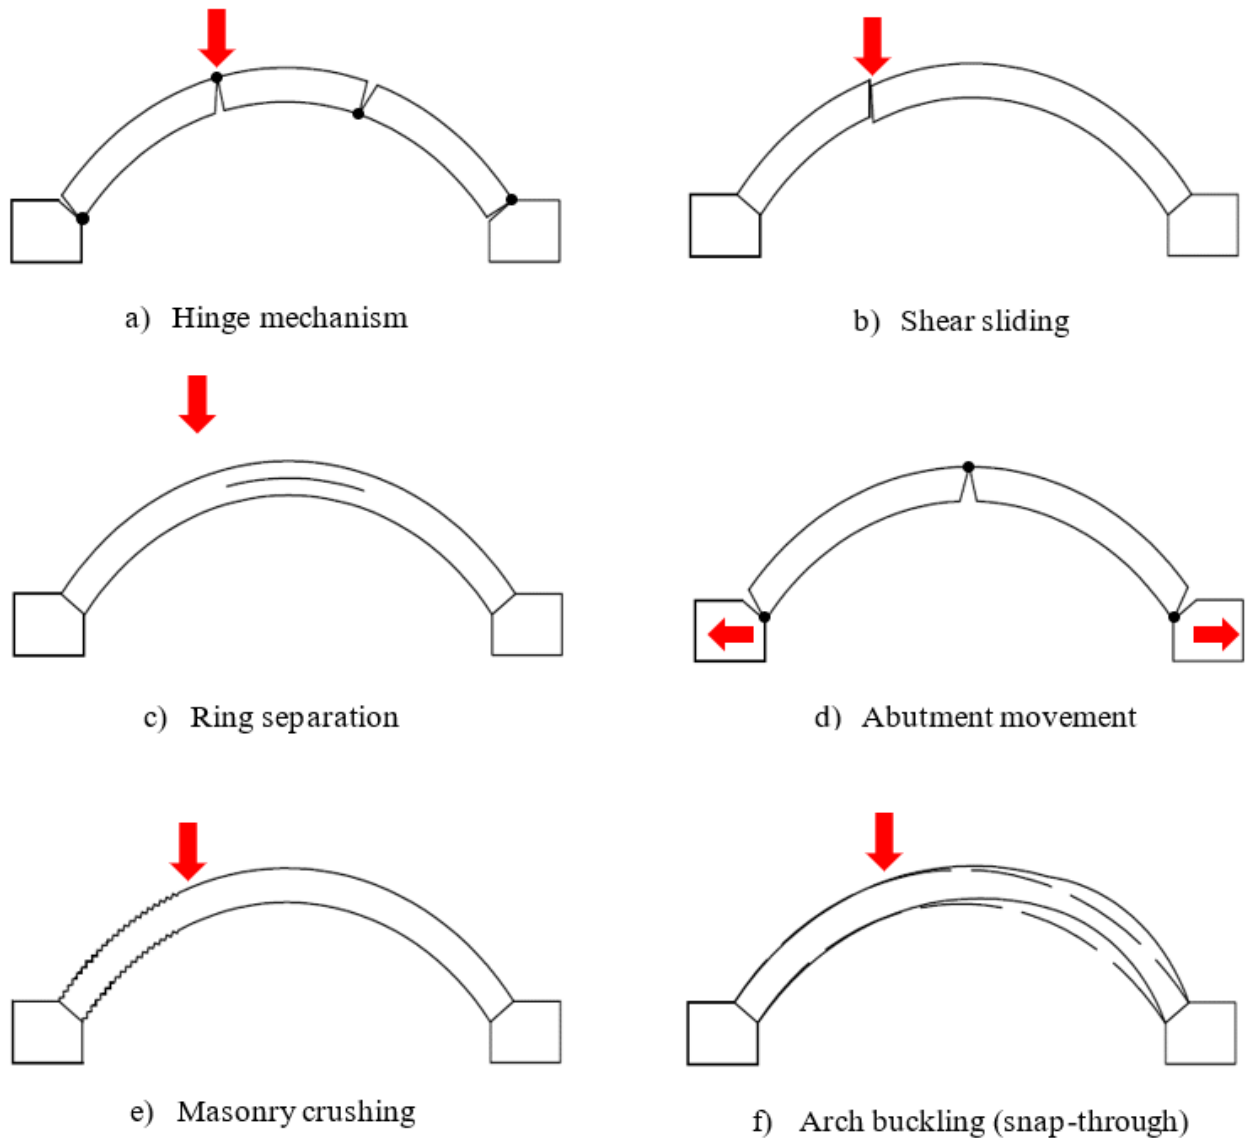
Six potential failure modes of a masonry arch (Adapted from Melbourne, Wang, Tomor, et al., 2007).
